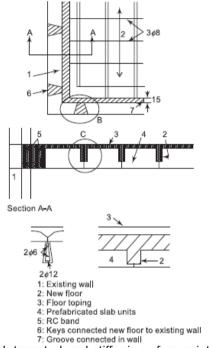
Integrated and stiffening of an existing floor 26.4.6 Substitution or Strengthening of Slabs
